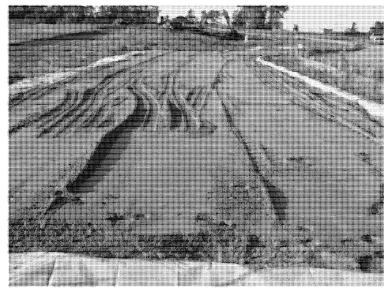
Woodbury Site - Haul Truck Weigh Scale East of Main Haul Road (9/11/2009 Photo by William Westley. Approved by Katie Winogrodzki.)
